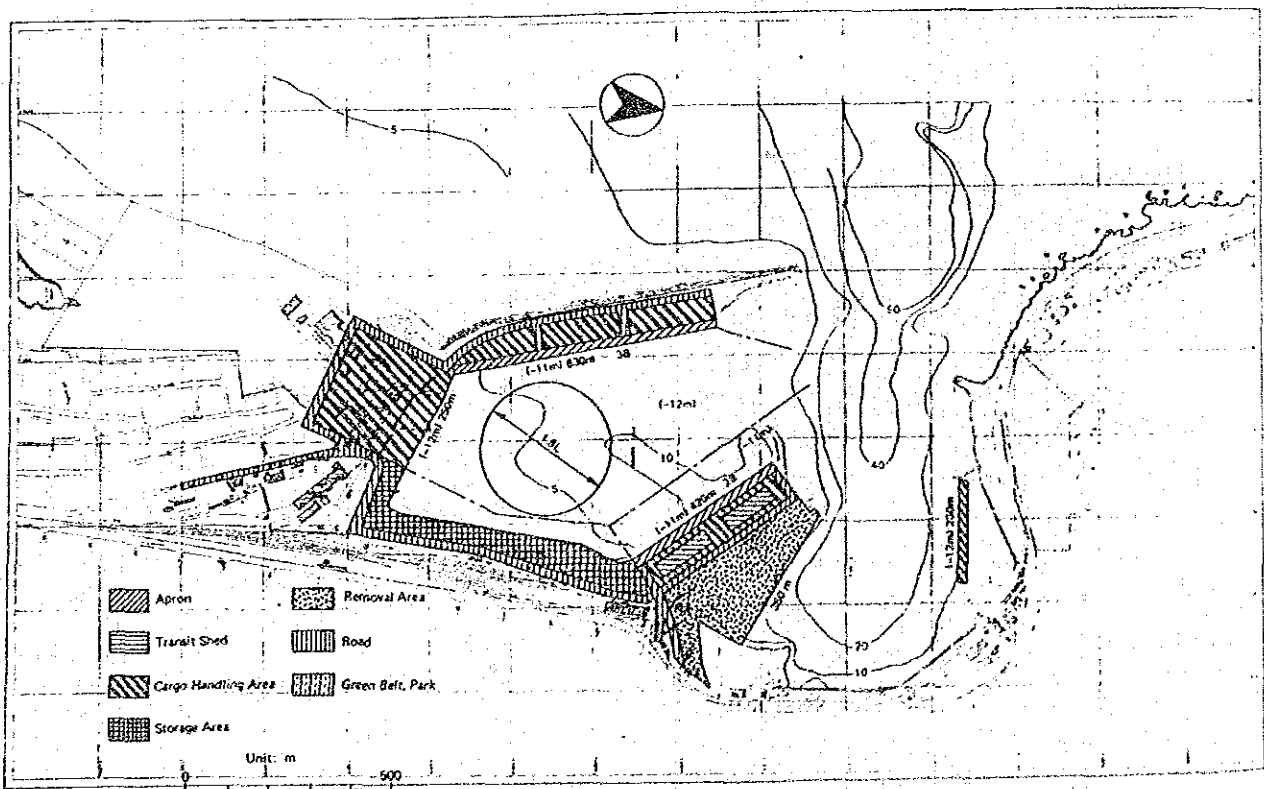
Master Plan of San Antonio Port (2010) Plan B
